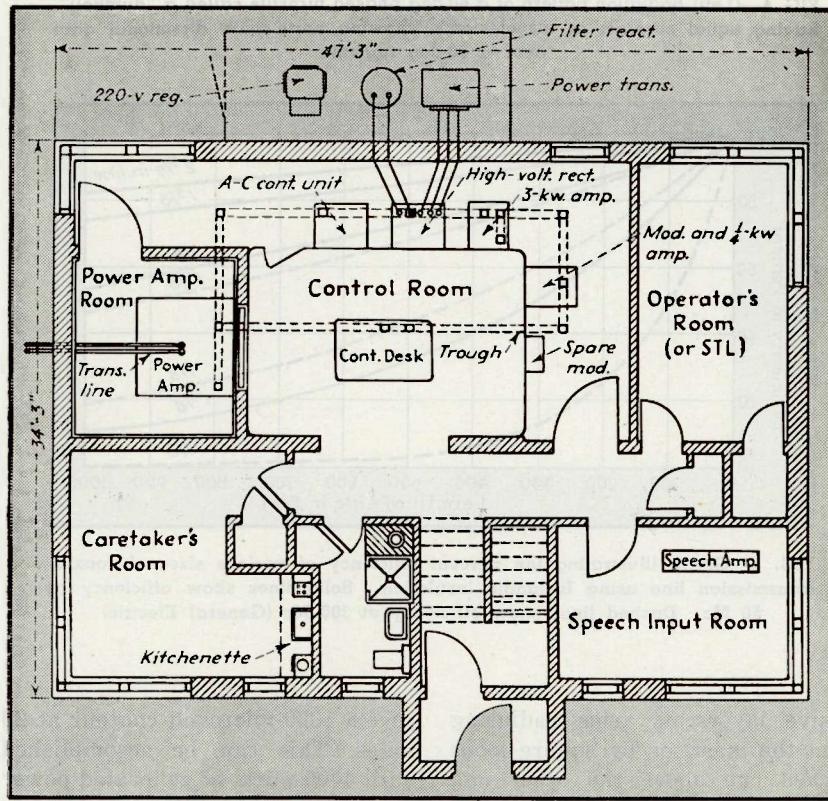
First-floor plan of the WMFM transmitter building at Richfield, Wisc.
